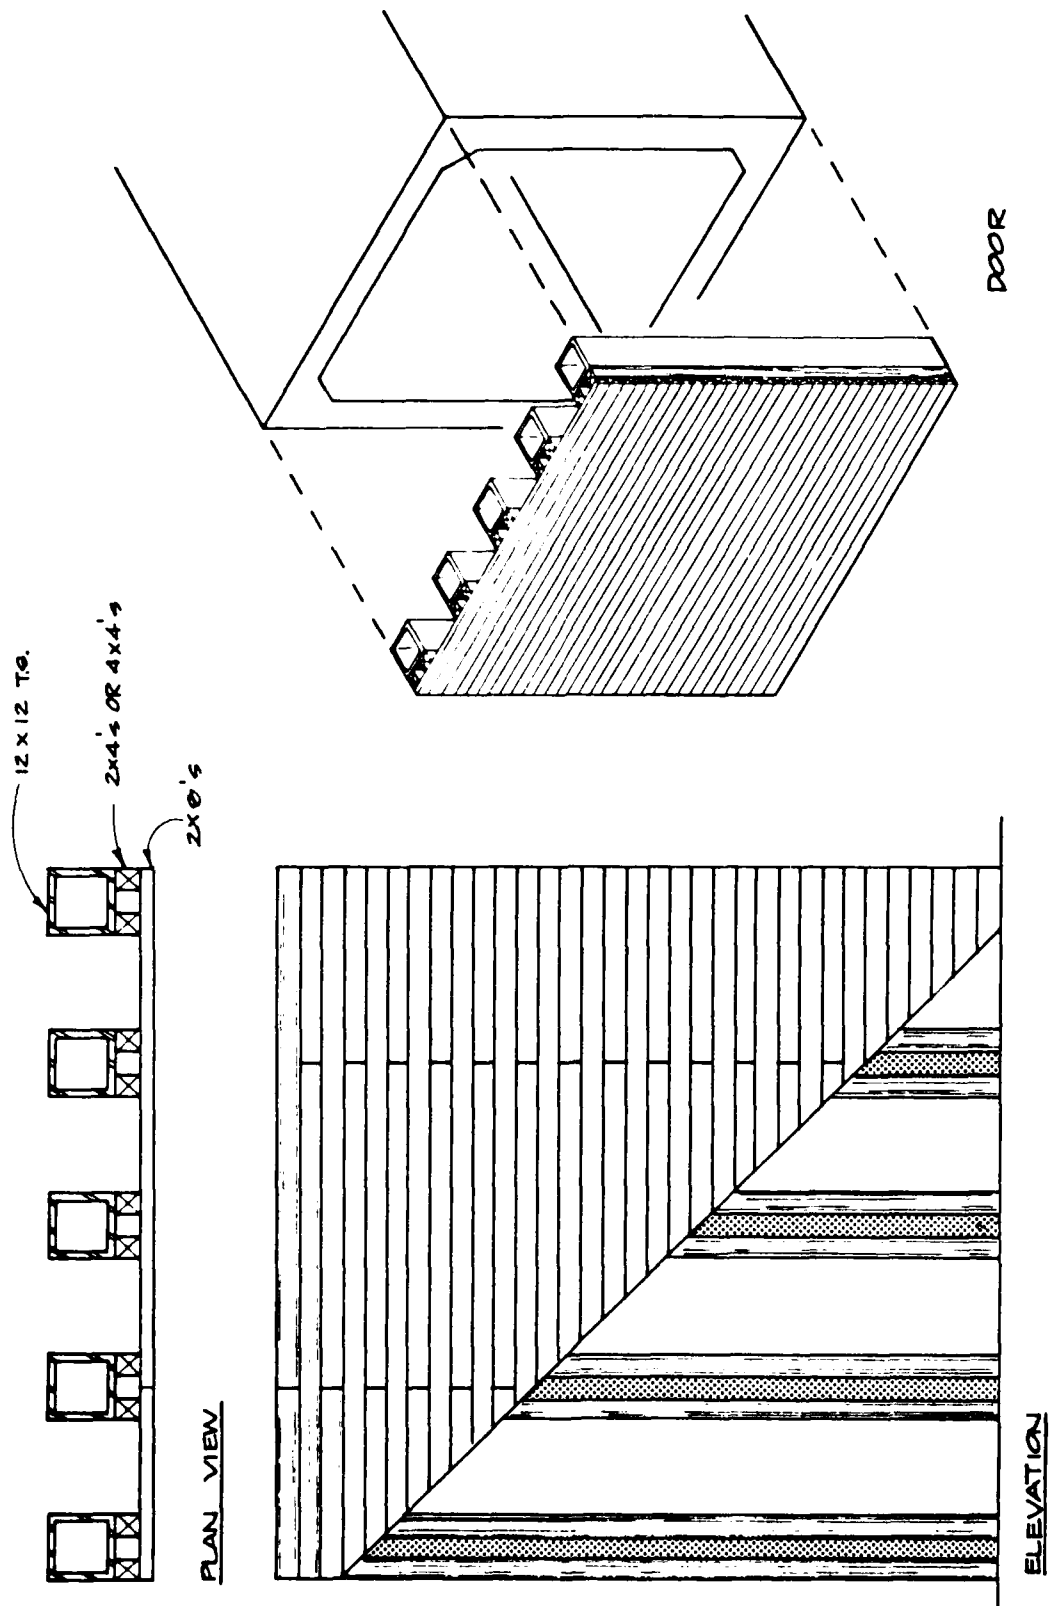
Typical Closure for a 10 ft by 10 ft Box Culvert For 40 psi.
